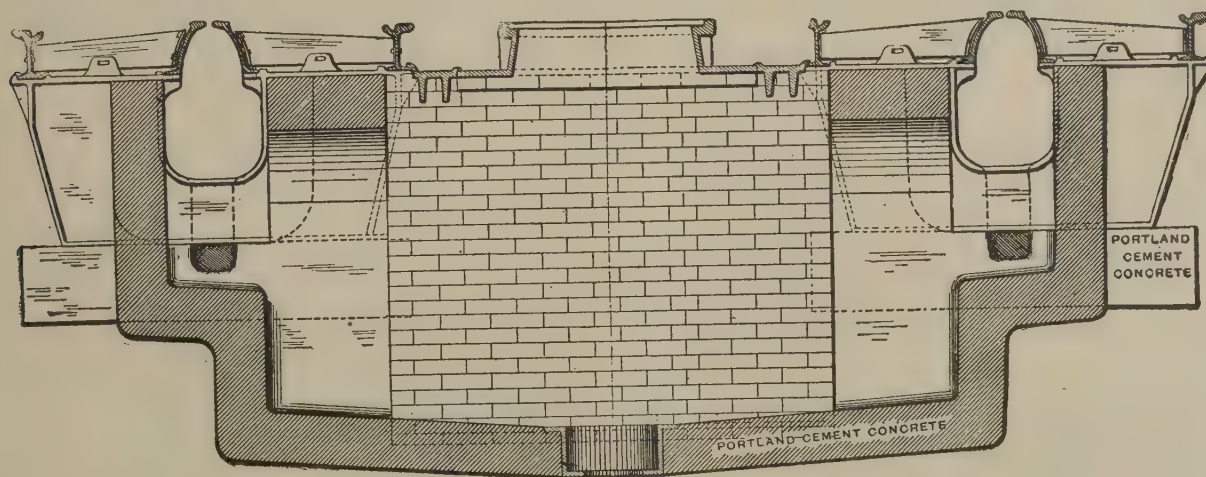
CROSS VAULT WITH SINGLE MANHOLE—THIRD AVENUE, NEW YORK, LINE.
